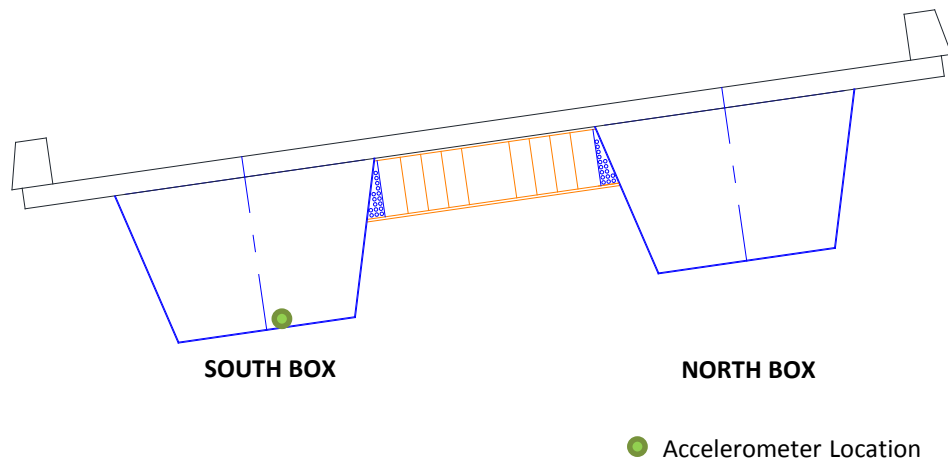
Cross-section view of the I-5 Interchange Bridge showing typical accelerometer location on the bottom flange of the south box girder.
